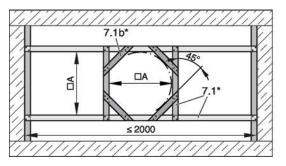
Shaft wall without metal support structure and with cladding on one side
